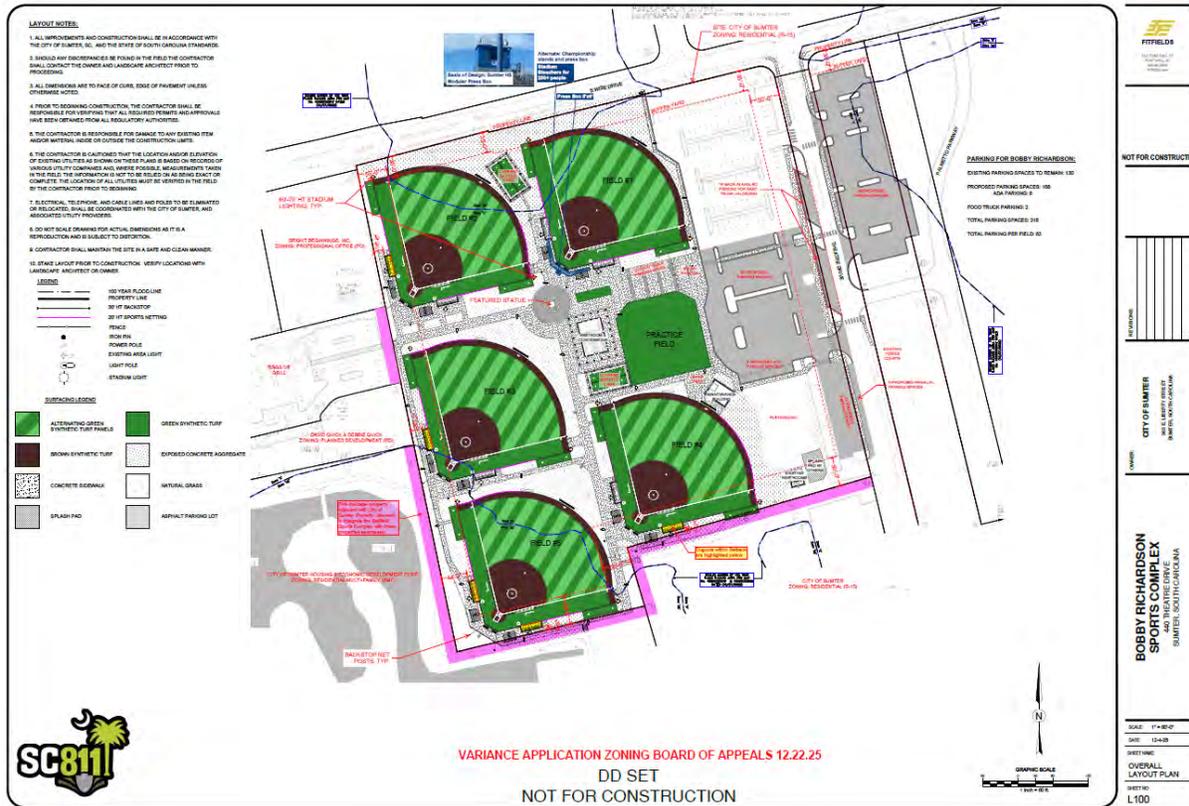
Site plan layout with Proposed Building Placement and Setbacks Noted
